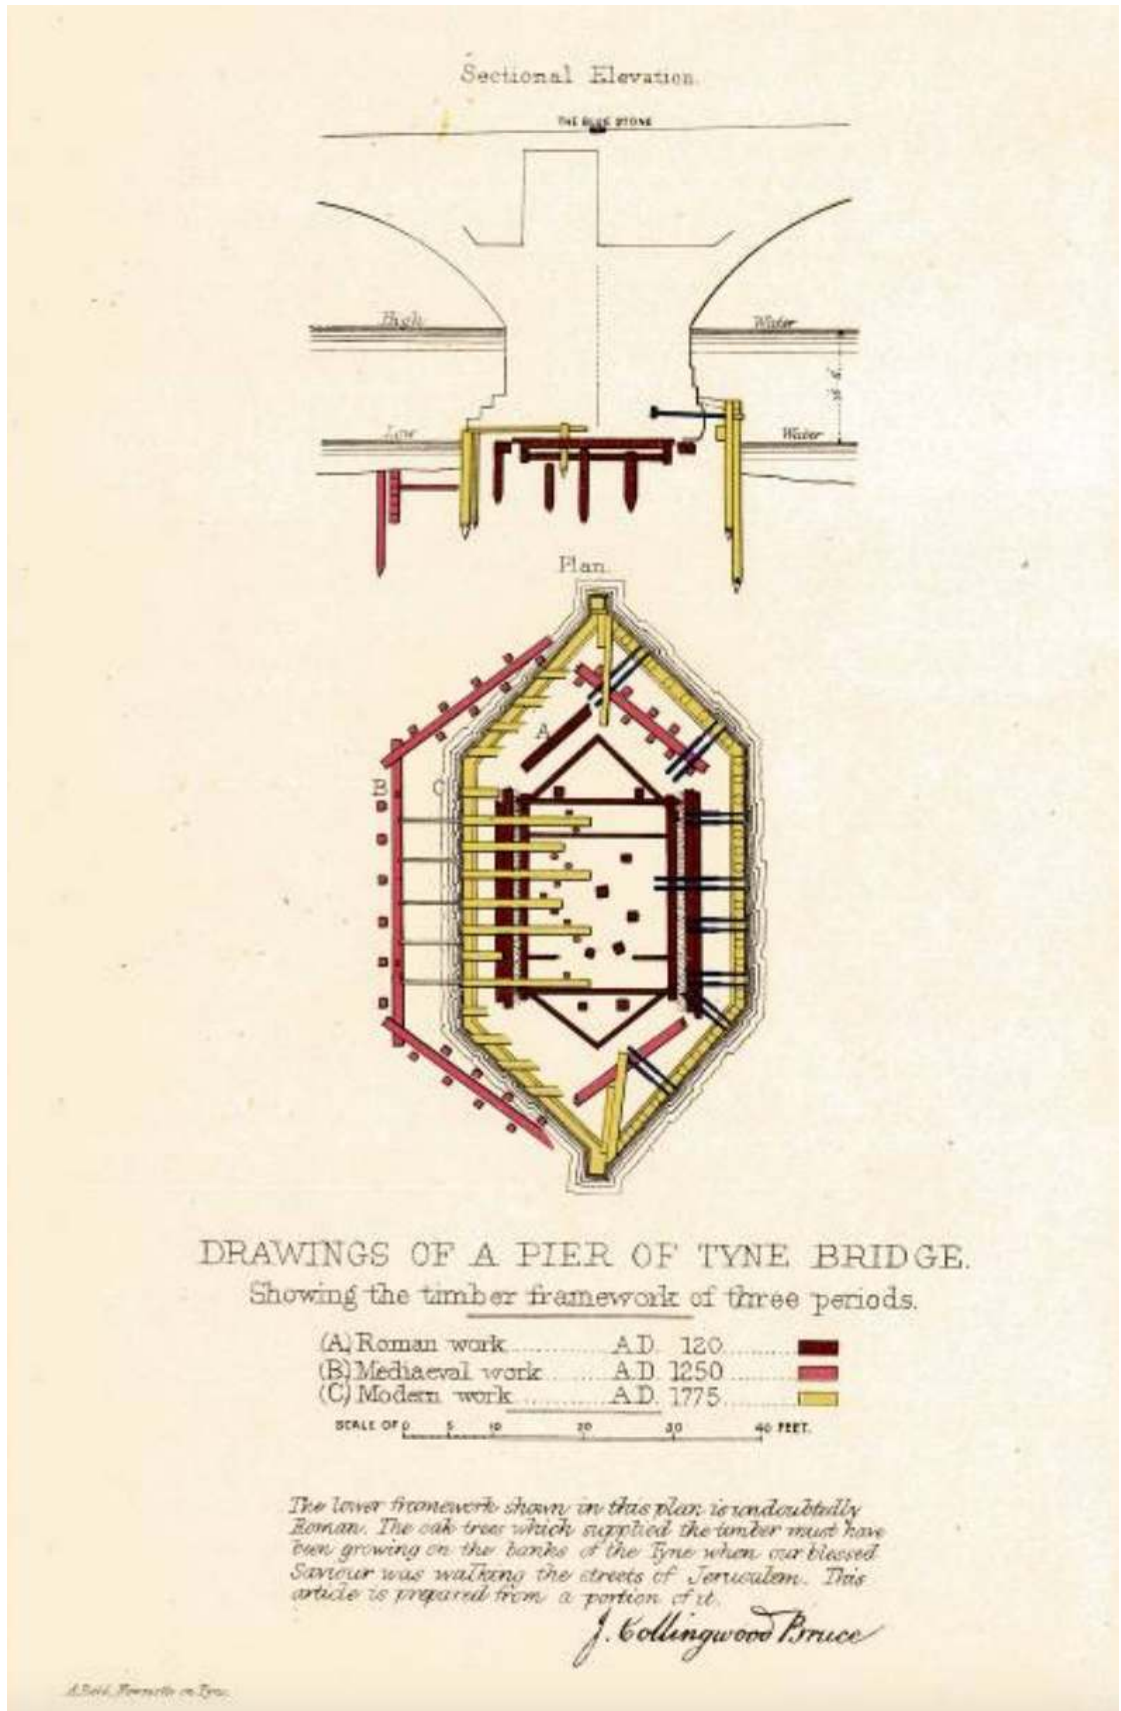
Bruce's plan of the pier foundations (© Tyne and Wear Archives and Museums).
